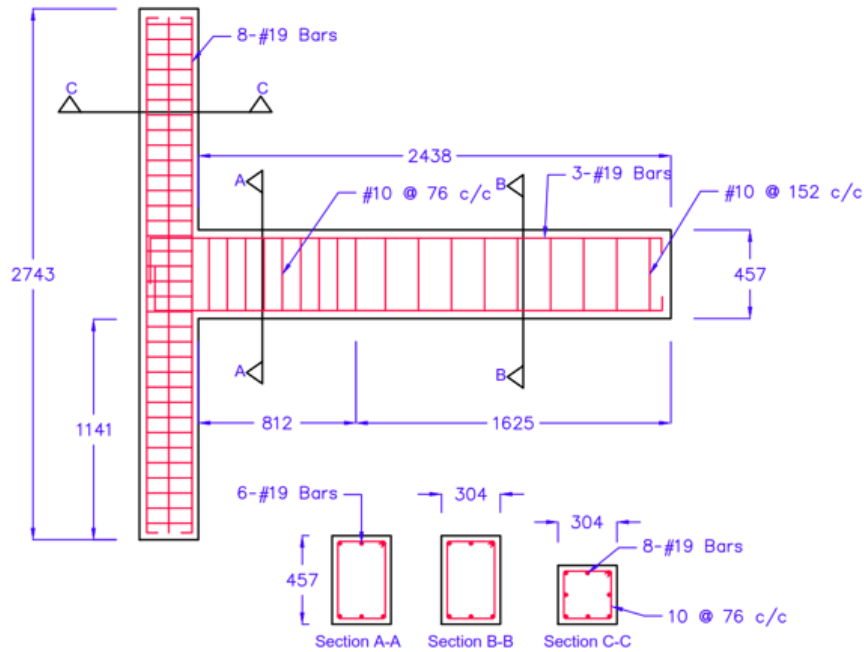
Dimensions and details of the exterior beam-column connection, all units are in mm.
